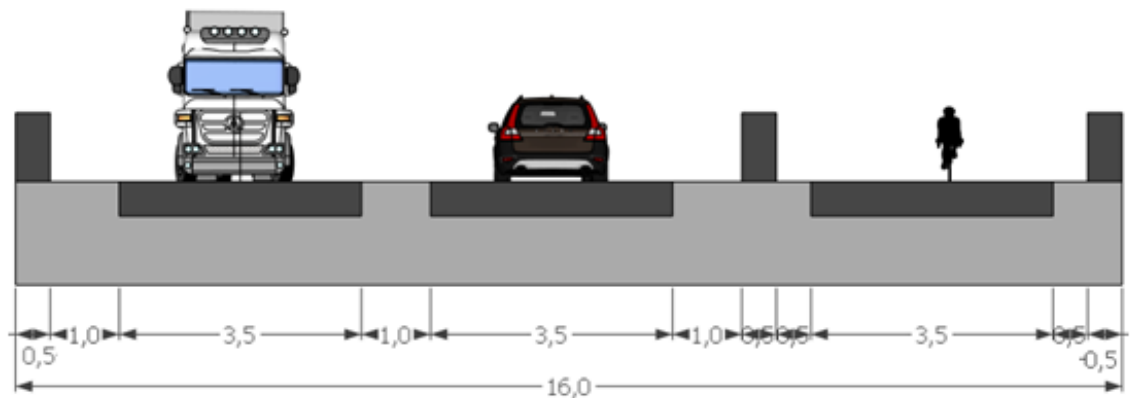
PROPOSED ROAD SECTION FOR BRIDGE CONCEPT [3]
